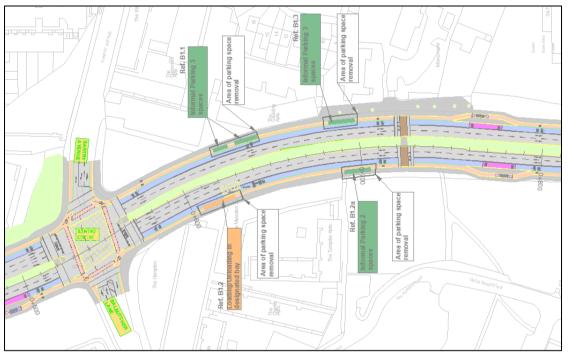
Proposed scheme design and parking changes along Ballymun Road (Between Santry Cross junction and Shangan Road junction).
